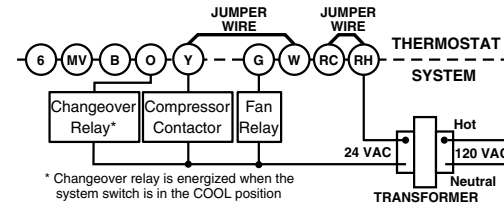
Typical wiring diagram for heat pump with cool active reversing valve
